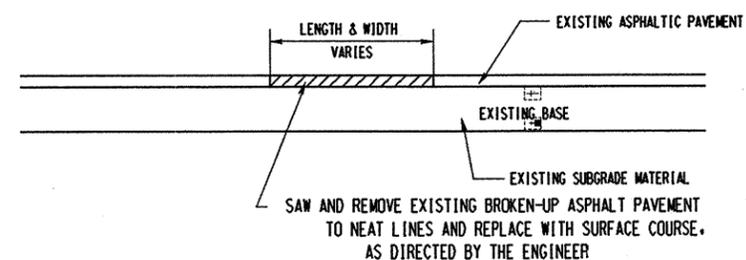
DETAILS OF REPAIRING EXISTING PAVEMENT PRIOR TO RESURFACING FOR FULL DEPTH AND MILLING
